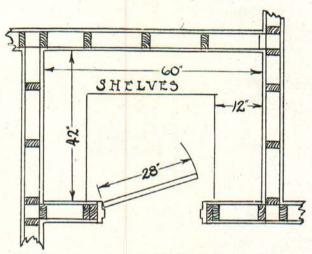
Above is a possible floor plan of a storage room for canned goods. The following dimensions may also be used as a guide in constructing and equipping such a storage space:
